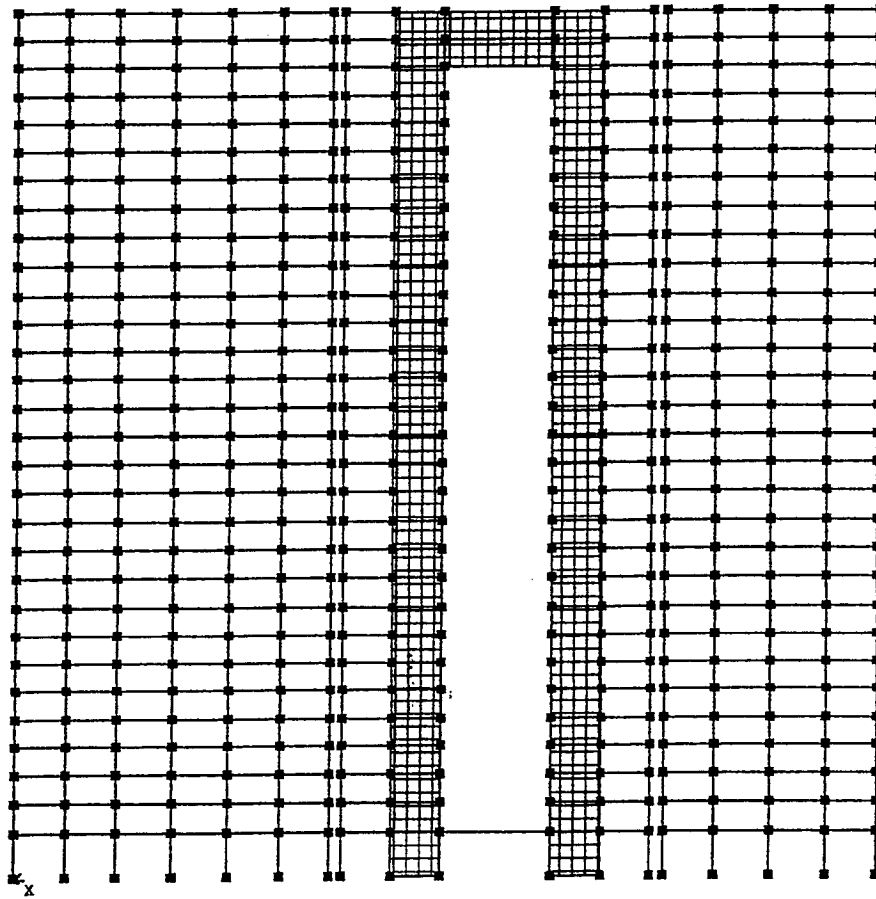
Retrofitted S-K Redesigned Building, Coupled Shear Walls, Top
